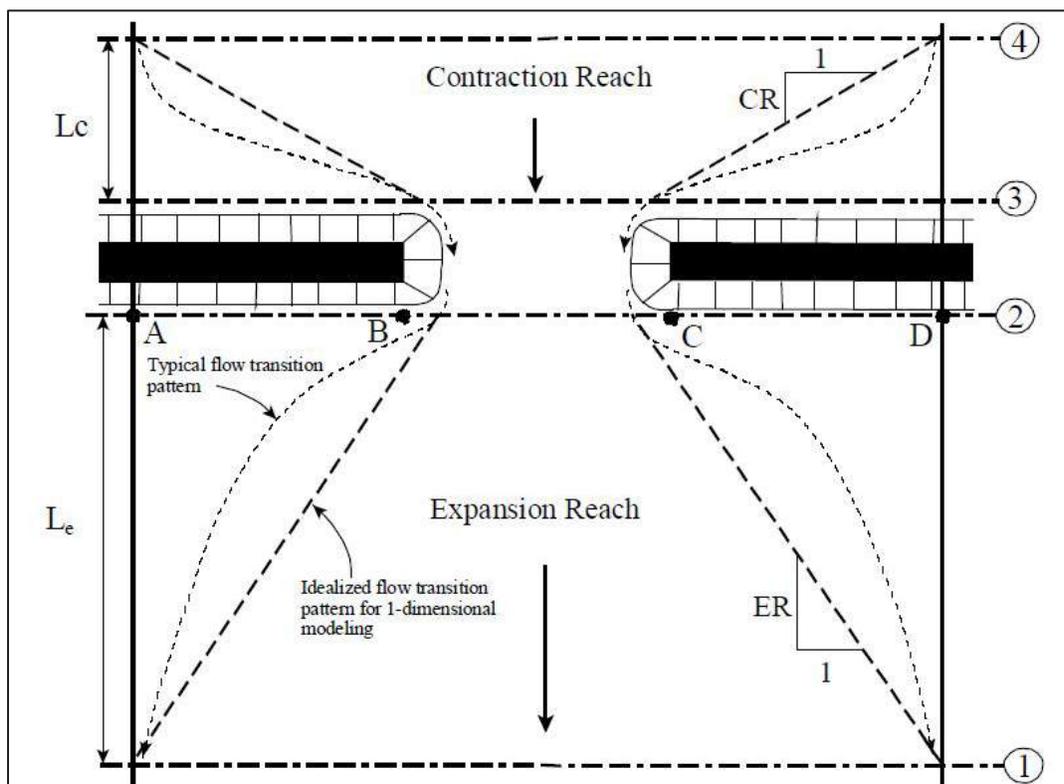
Cross Section Locations for Hydraulic Crossings
